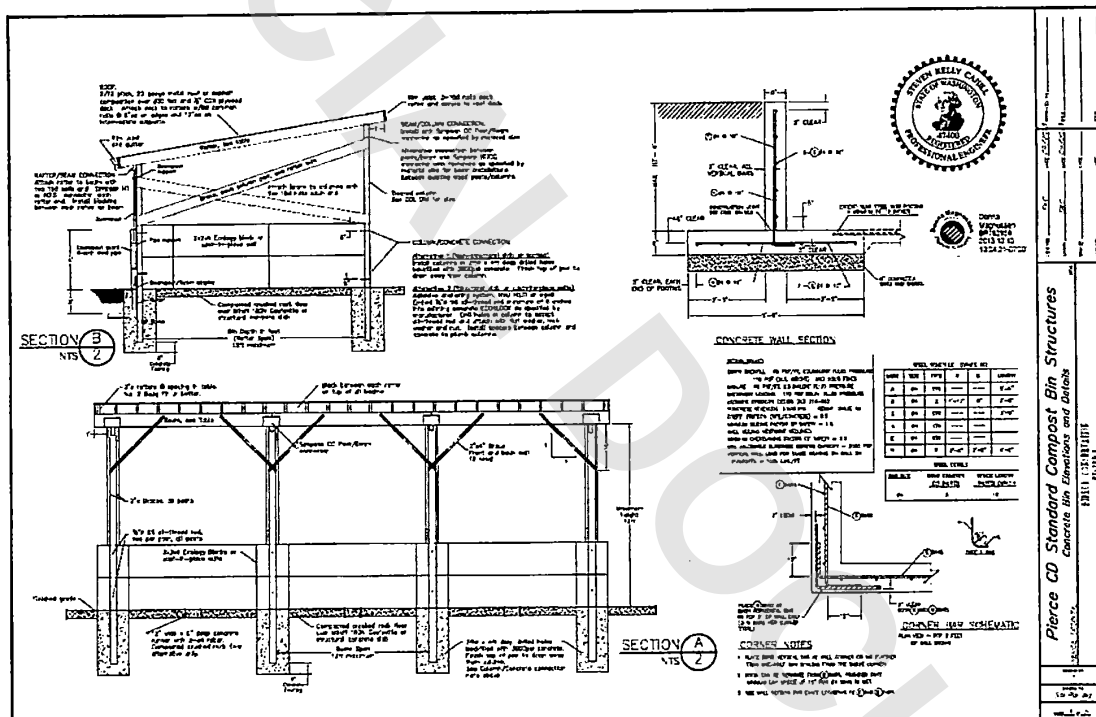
Manure Storage Structure. Plans will be modified to have two bins within the same footprint. Walls between the bins will be wooden.
